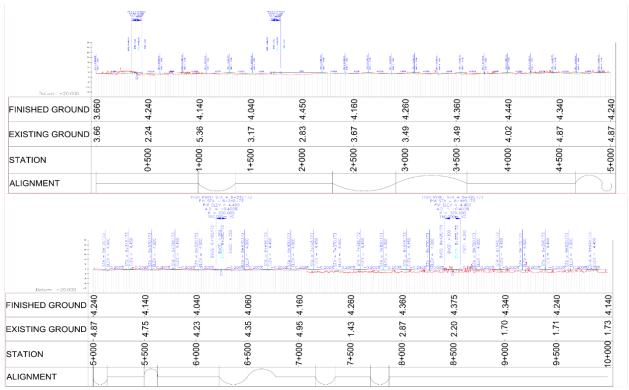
Alignment Profiling of the Proposed Coastal Road (0+500 to 10+000)
